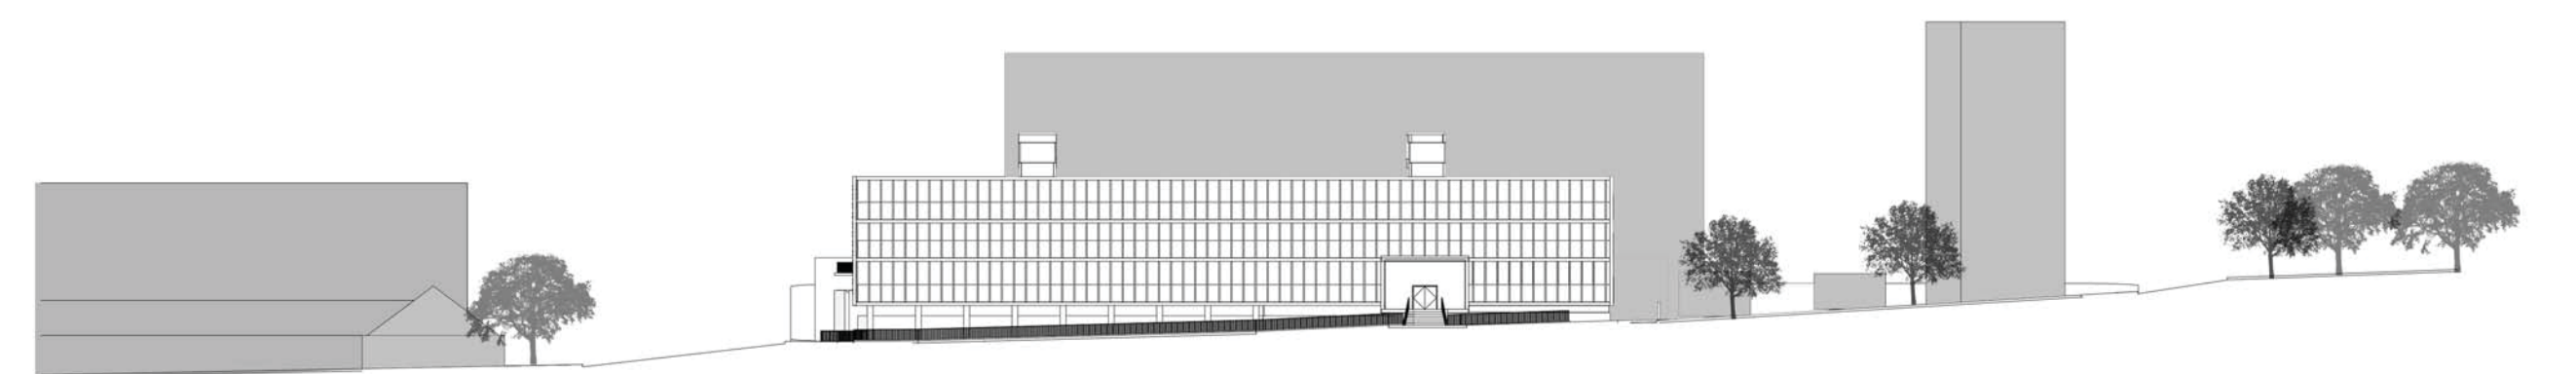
East West Site Section showing the scale of the Meat Board building in its context.
